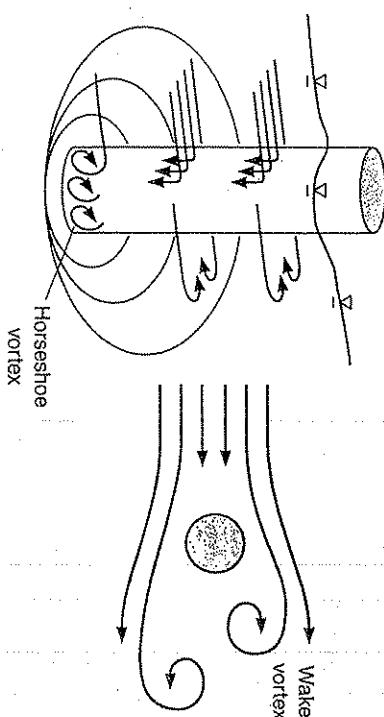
Schematic representation of scour around a bridge pier (Richardson and Davis 1995).
